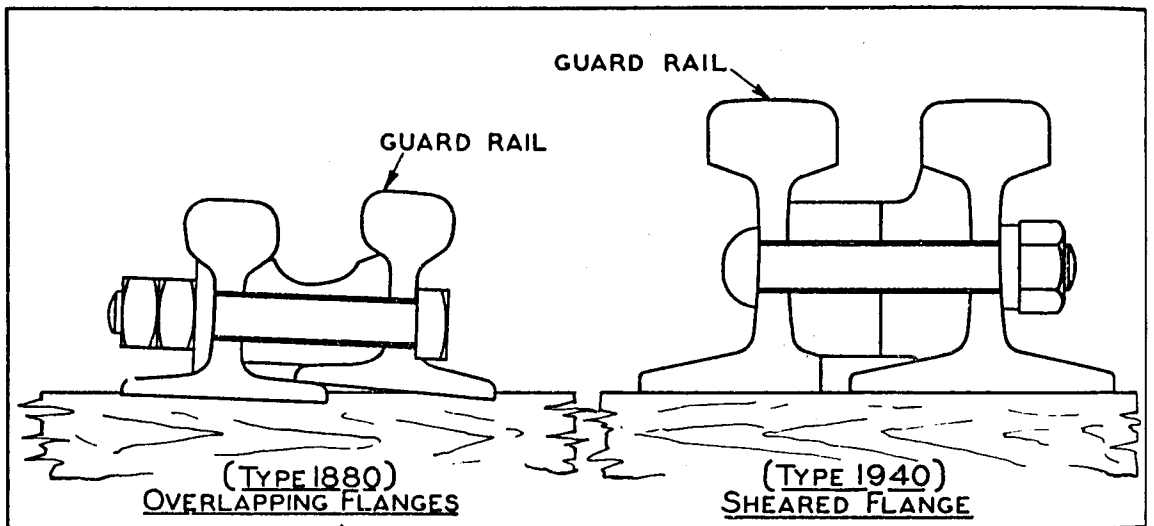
ARRANGEMENT OF GUARD RAIL FLANGES.
